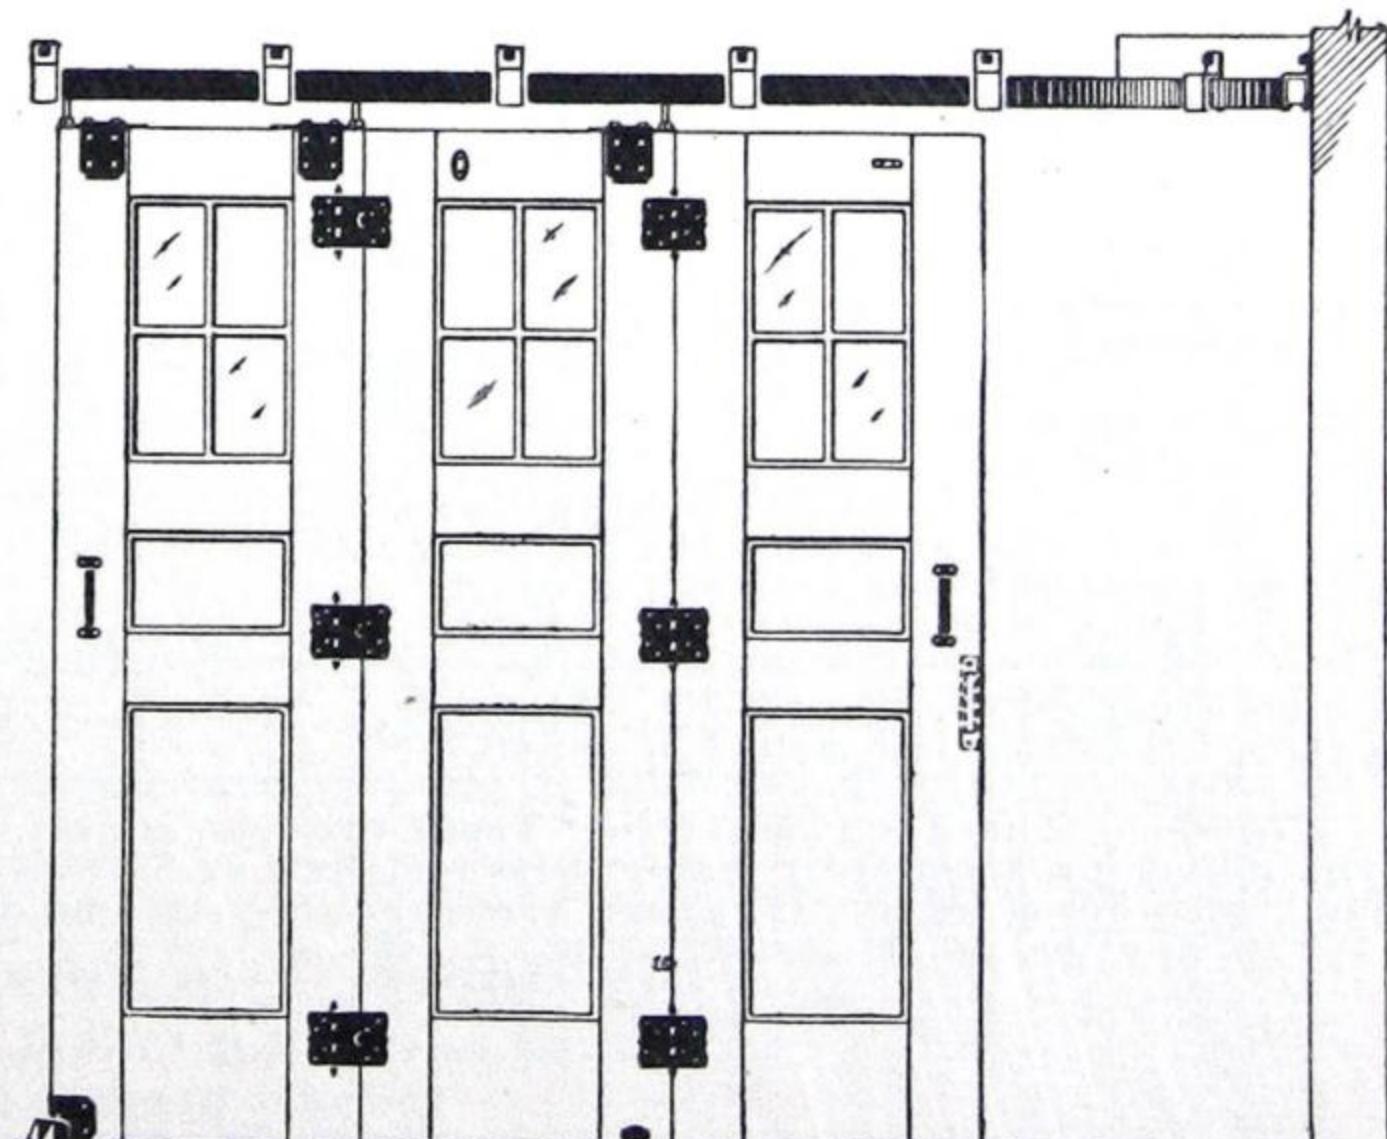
Interior elevation showing Set JJ-2, including one 525 Door Lock.
